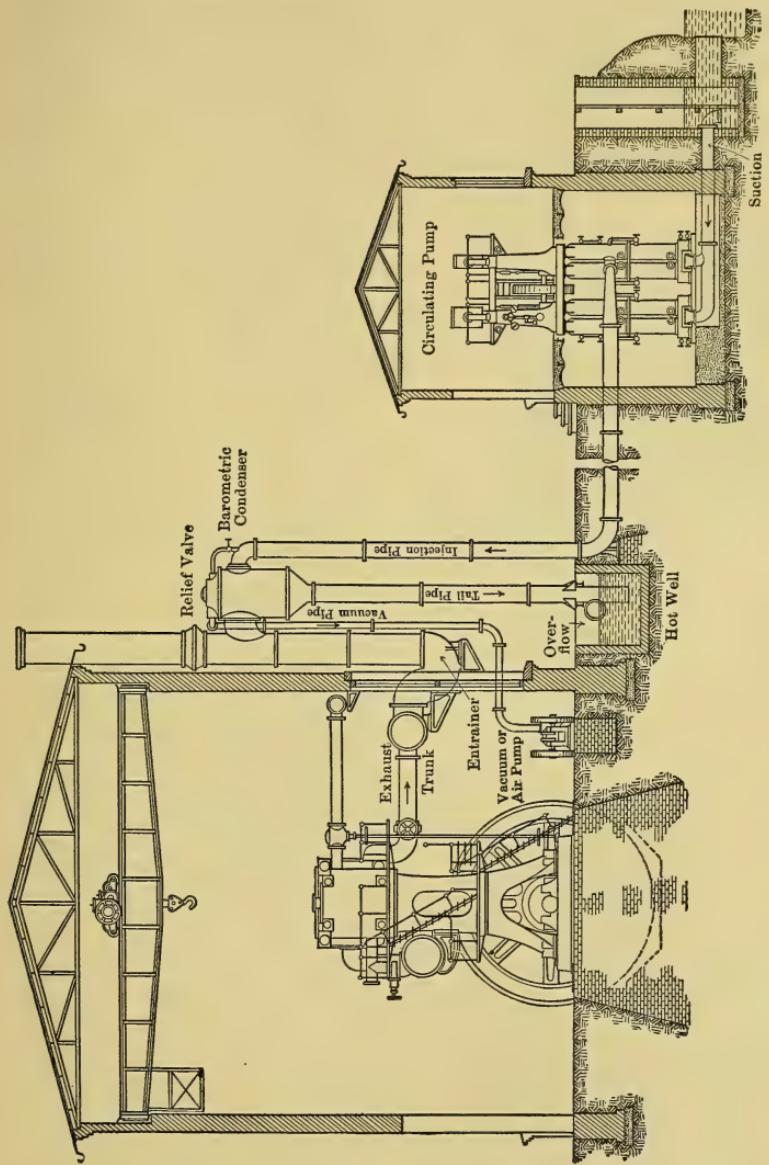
Method of Connecting Barometric Condenser to Steam Engine.
